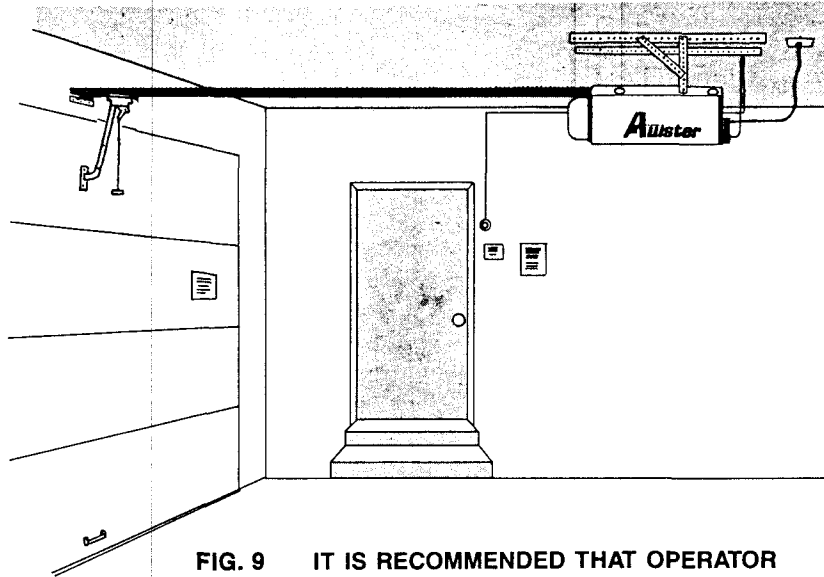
IT IS RECOMMENDED THAT OPERATOR INSTALLATION BE A MINIMUM OF 7' ABOVE FLOOR LEVEL
